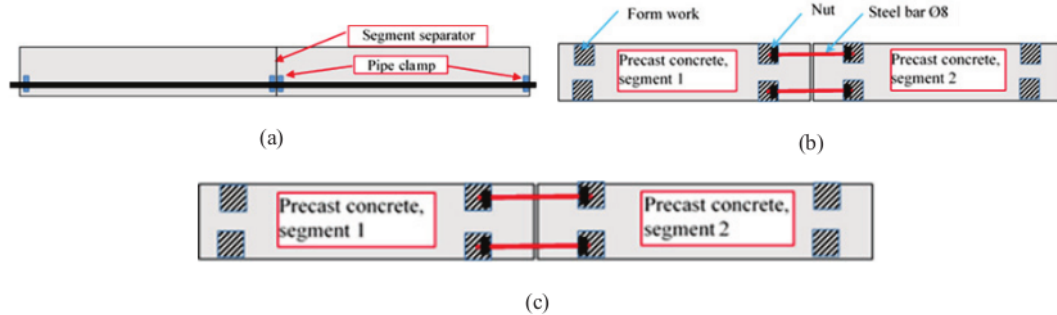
Connector between segments of precast concrete, (a) position of pipe clamp as anchorage, (b) top view of connection of precast concrete, (c) side view of connection of precast concrete
